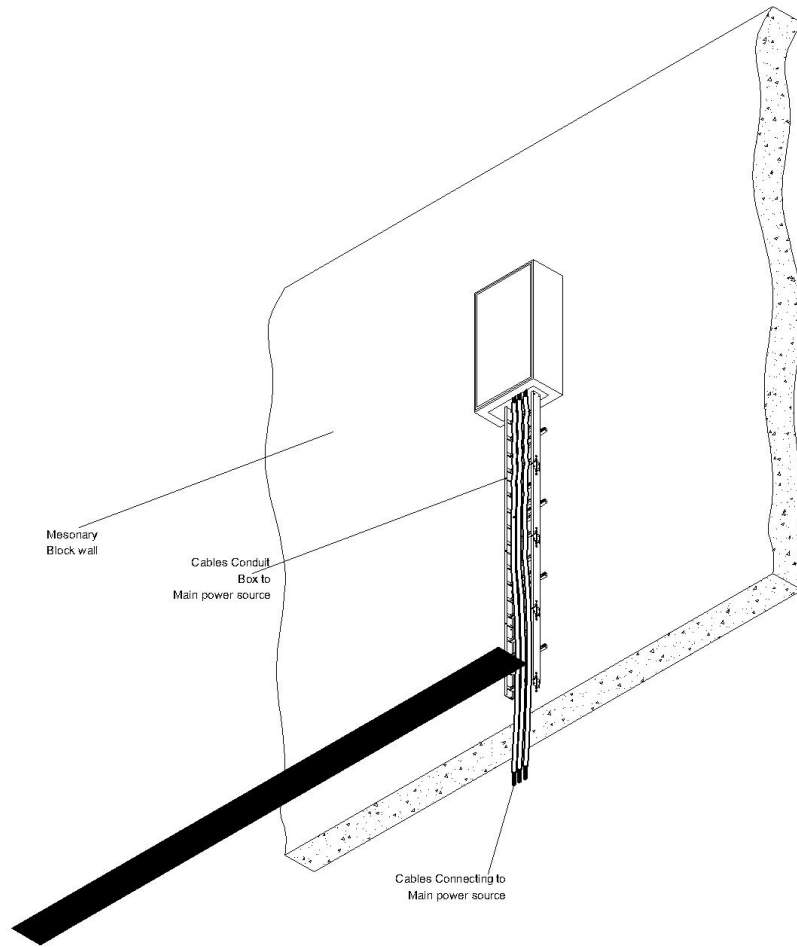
Diagram illustrating electrical cable routing from charging units to the electrical room, including conduit path and connection points.
